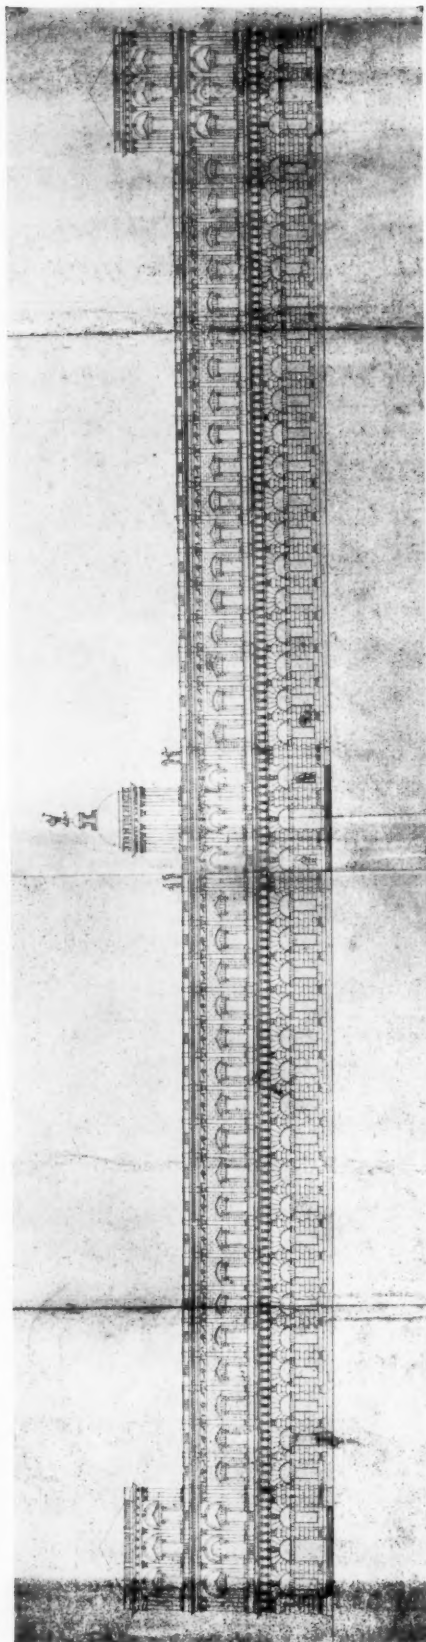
EAST ELEVATION OF THE SAME DESIGN AS FIG. 11
